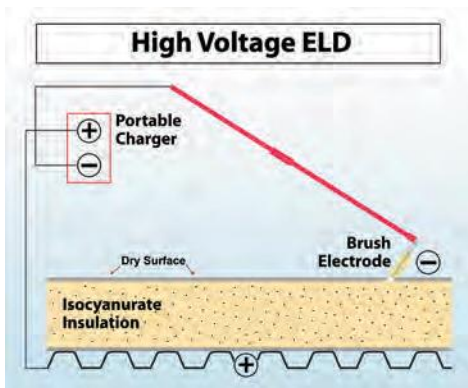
Whether conducting High or Low Voltage testing, breaches will not be detected when there are electrically insulating materials between the membrane and the conductive deck.
